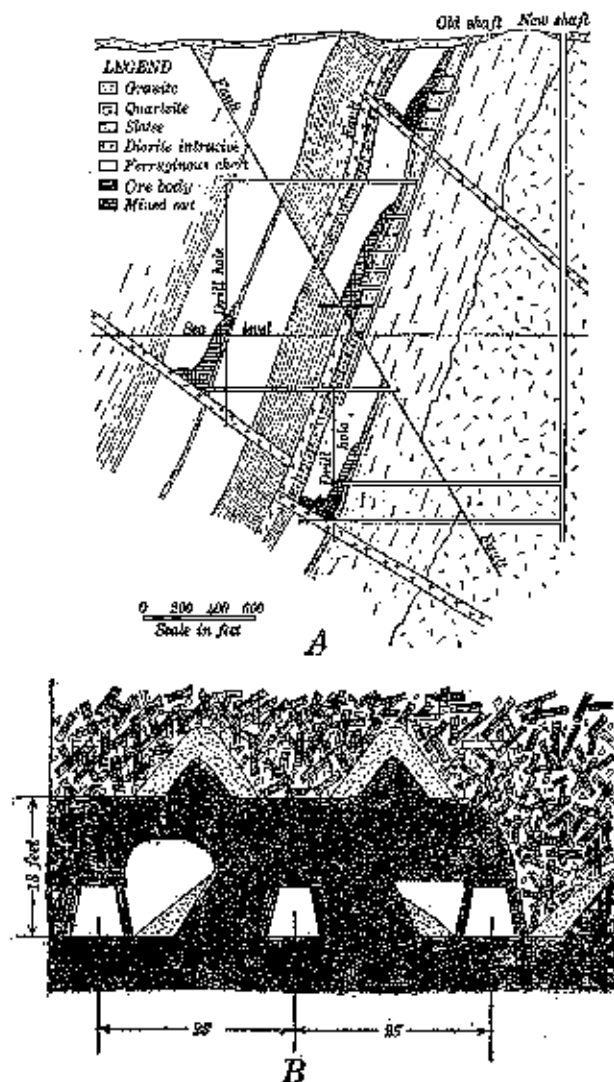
Sublevel caving, Marquette-Asteroid mine, Michigan: A, Typical cross section of a Gogebic range mine; B, method of caving back on retreat.
